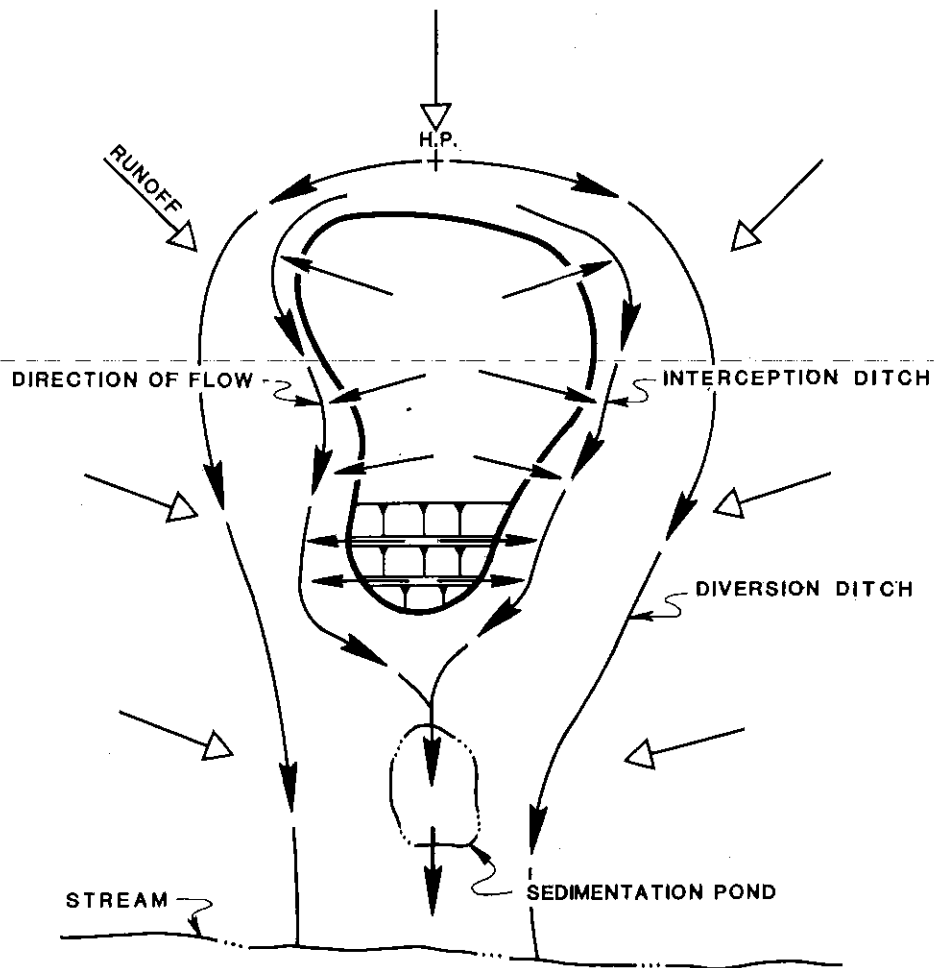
Schematic plan view of interception and diversion ditches around a valley landfill.
